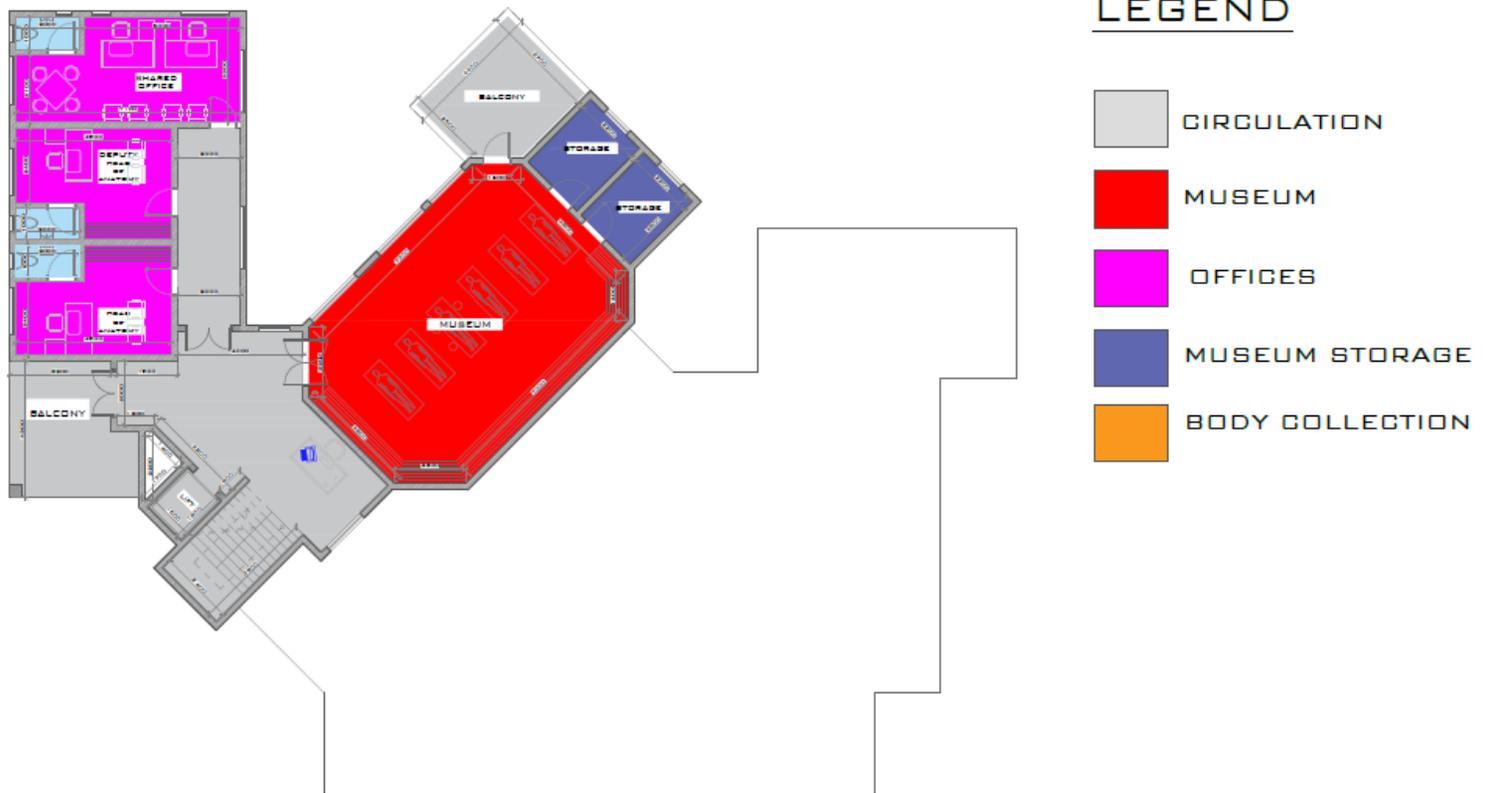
5: First Floor plan of an Anatomy Laboratory
